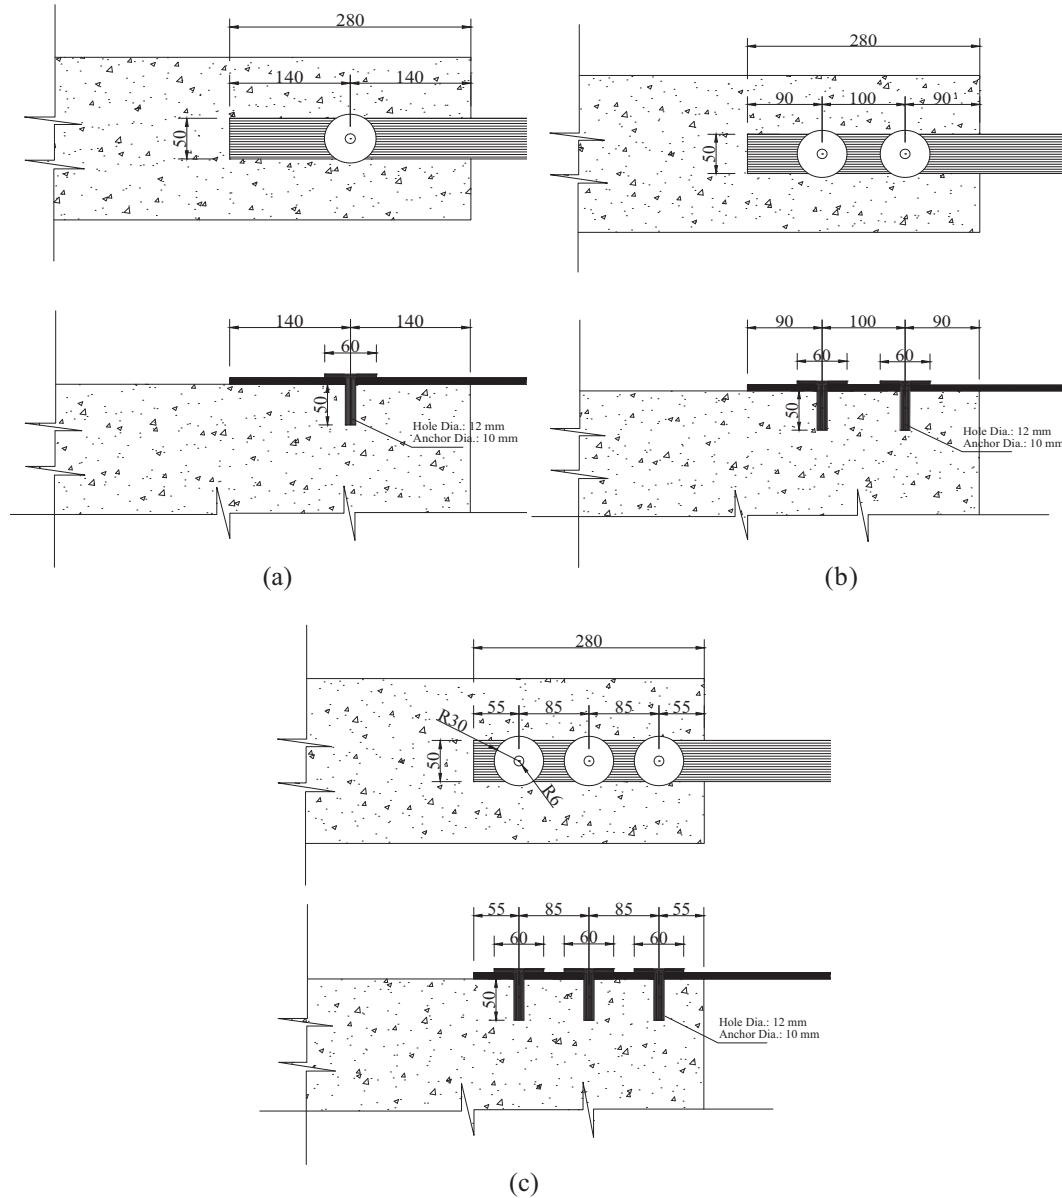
Plan and side views of test specimens with (a) one anchor, (b) two anchor, (c) three anchor.
